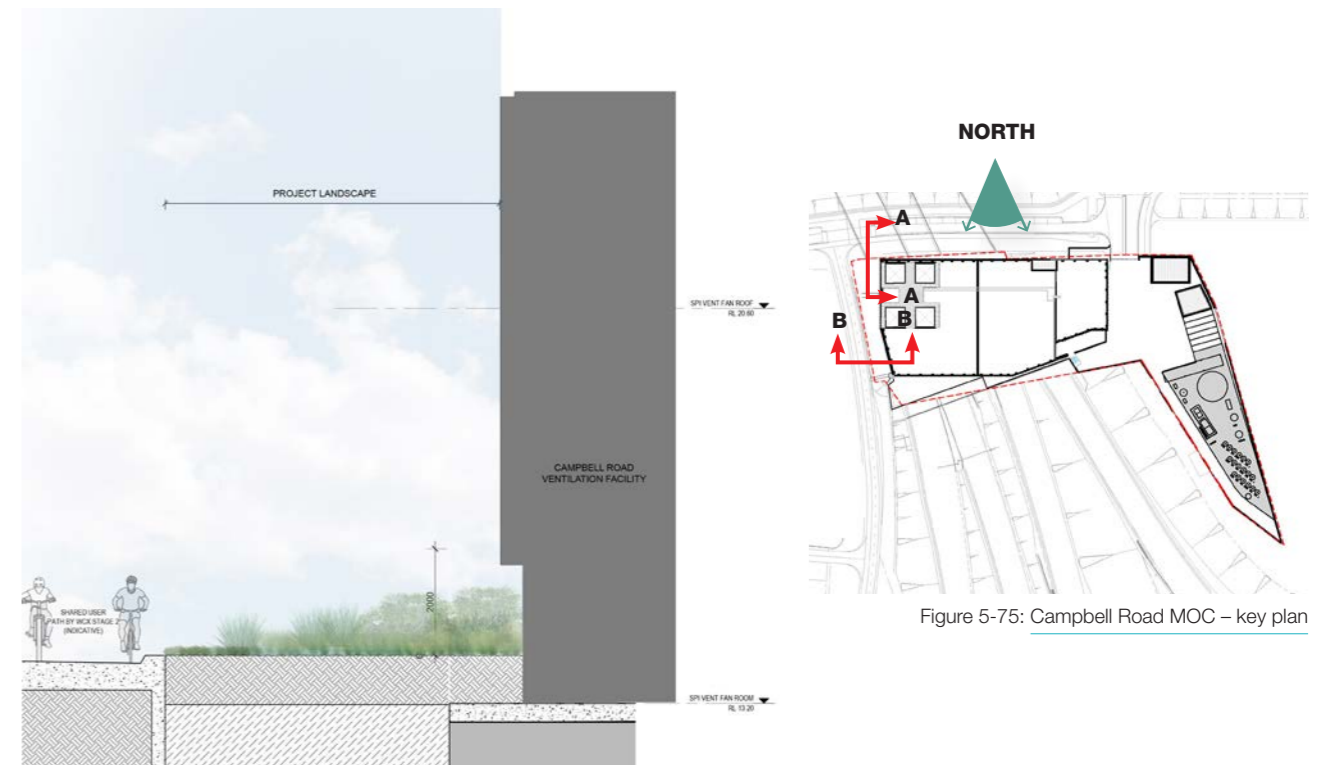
Campbell Road MOC section BB – shared user path looking north
